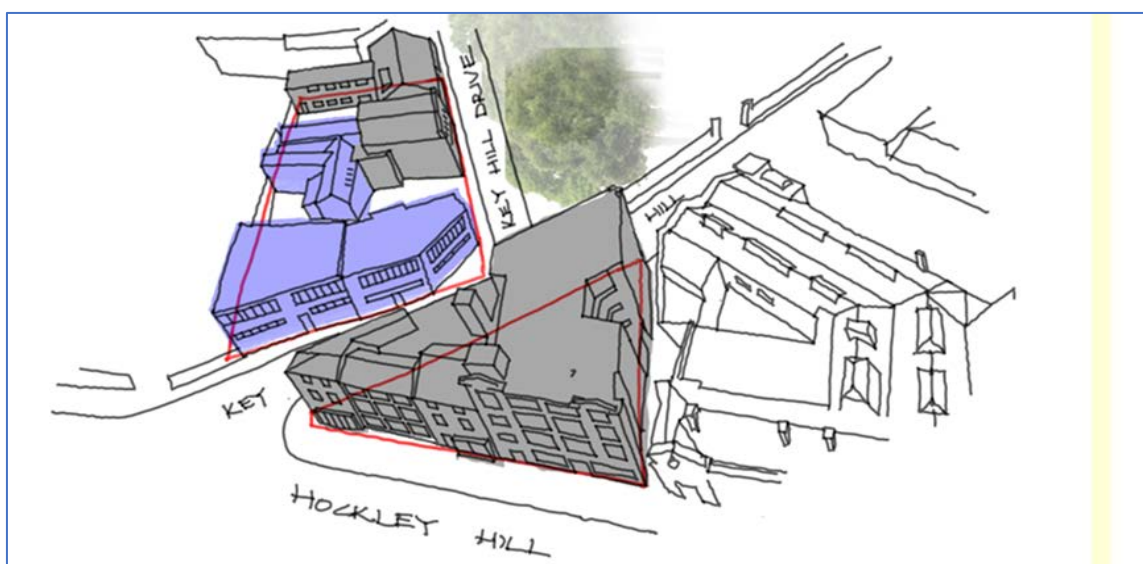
Diagram showing retained buildings in grey and demolitions in purple
